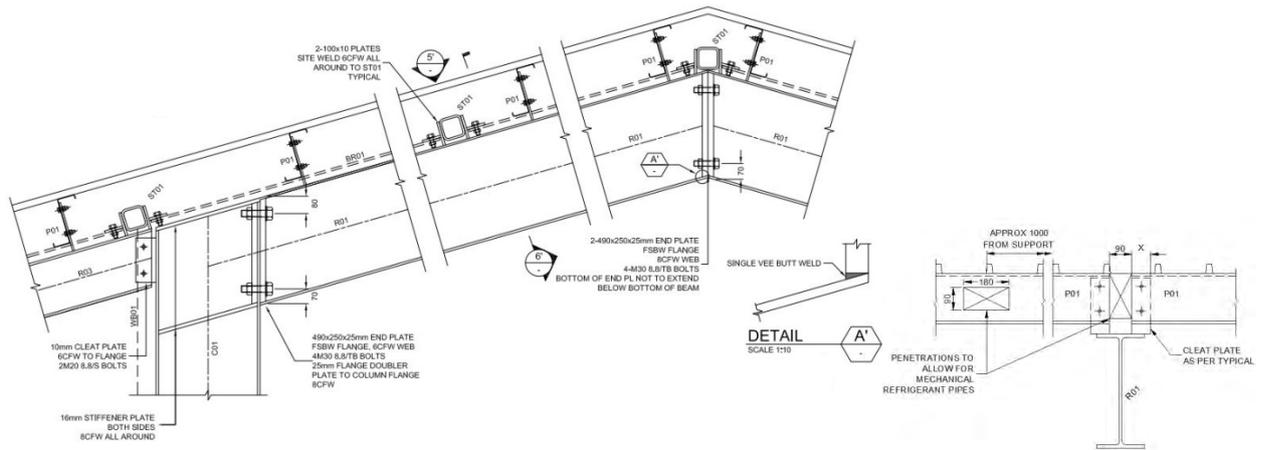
Ingenuity evidenced by refined engineering detailing & connections
